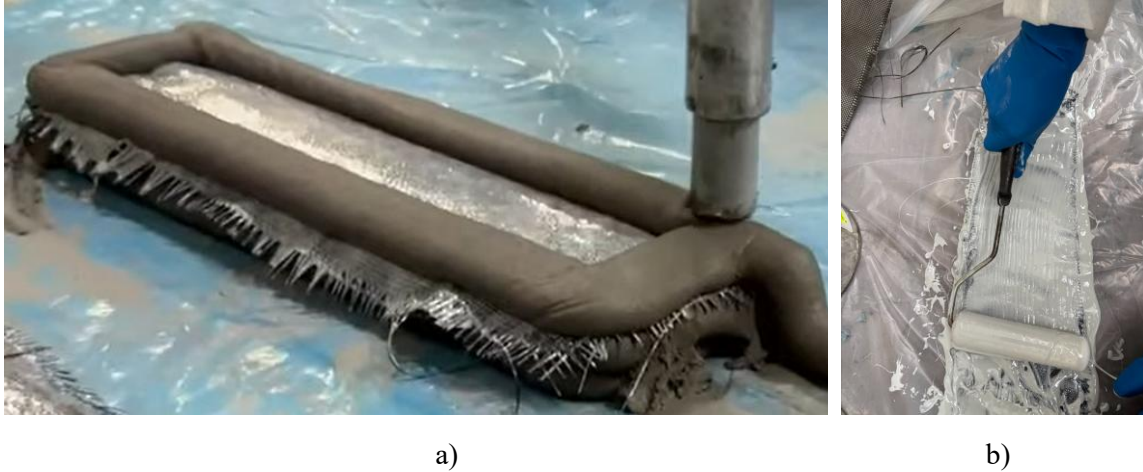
(a) 3D printing on wet CFRP fabric, (b) Wet CFRP fabric
